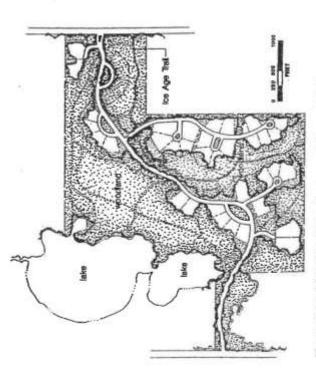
Site plan of the Preserve at Hunter's Lake.
